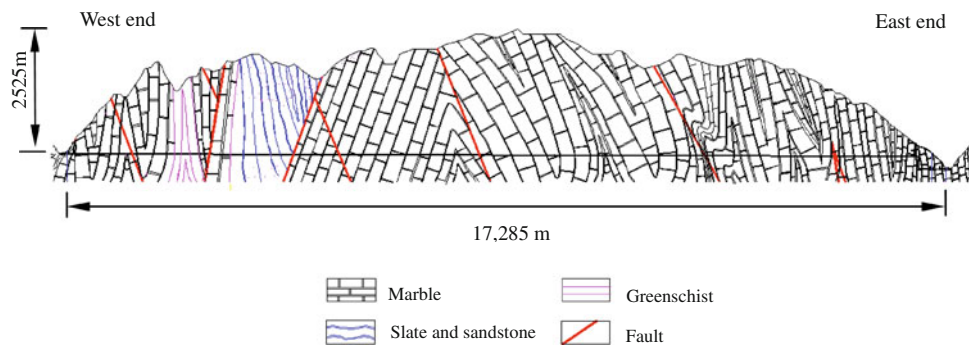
The layout of the tunnels at the Jinping II Hydropower Station (m)
